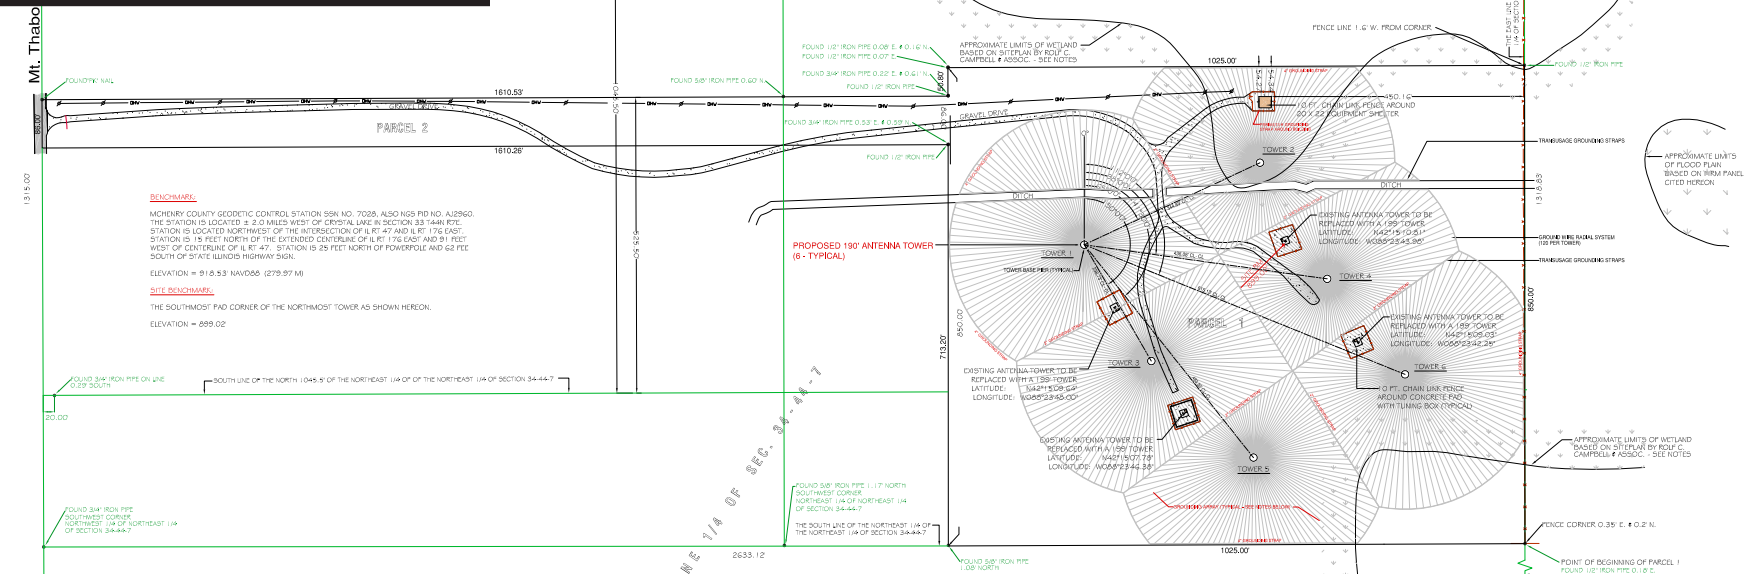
FIGURE 3 PROPOSED TRANSMITTER SITE PLAT PLAN (Sheet 2 of 3)
